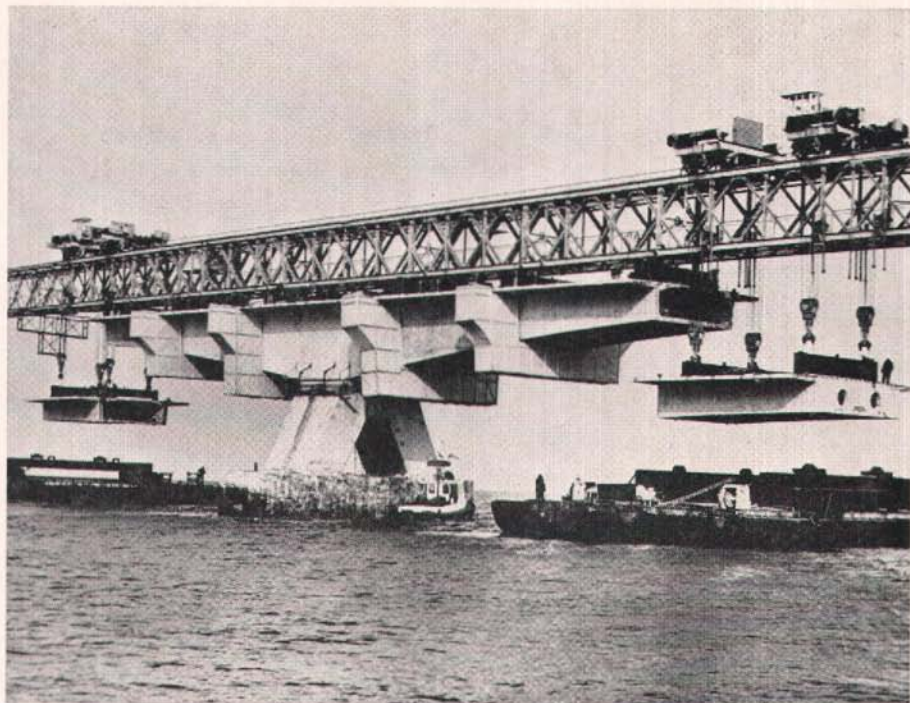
Overhead falsework truss is used to erect the precast superstructure elements
